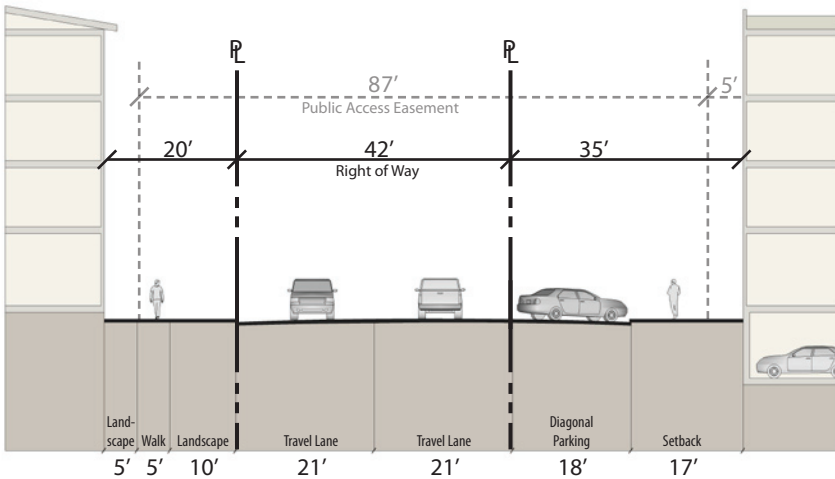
Section D - Entry Drive (with diagonal parking)
